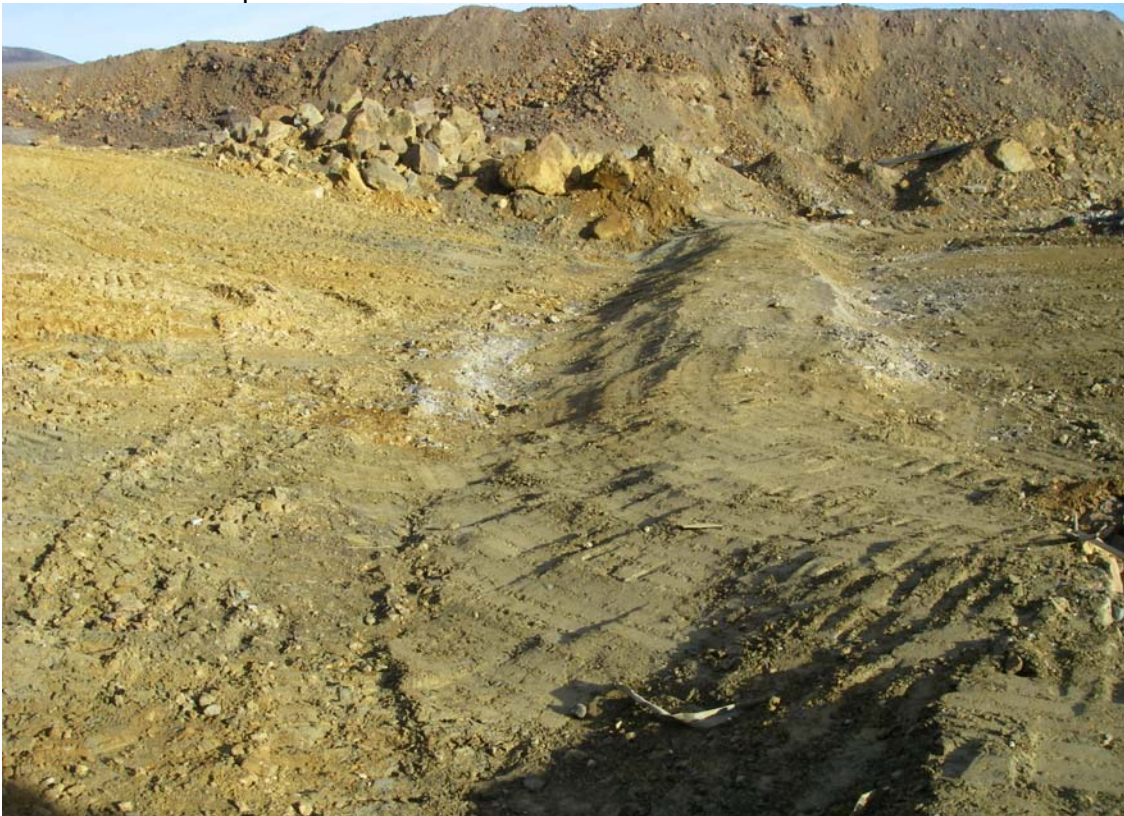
Detail of drainage ditch and drainage retention windrow. The repository is located on the left side of the photo.
